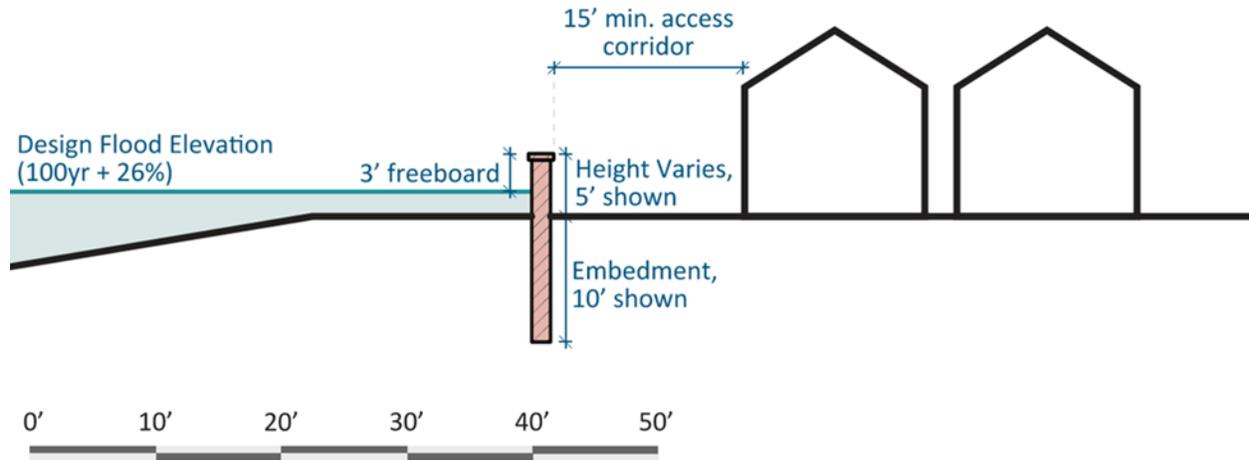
below depicts conceptual-level sketches of the small and medium (sheetpile) and large floodwalls (concrete T-wall). As previously noted, floodwalls in areas with poor geotechnical characteristics, i.e., soft soil, may require concrete T-walls or similar structures at heights less than 12 feet and should be assessed in future design phases.
